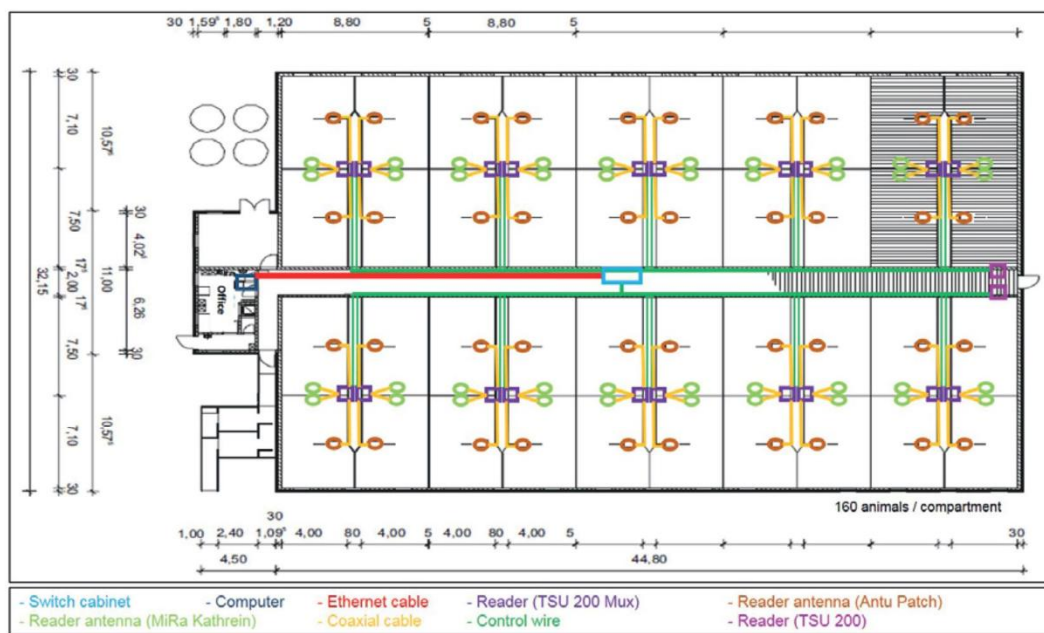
Plan elevation of example barn B for 1600 fattening pigs with illustration of fitted RFID system hardware components (© KTBL 2015b, altered)
